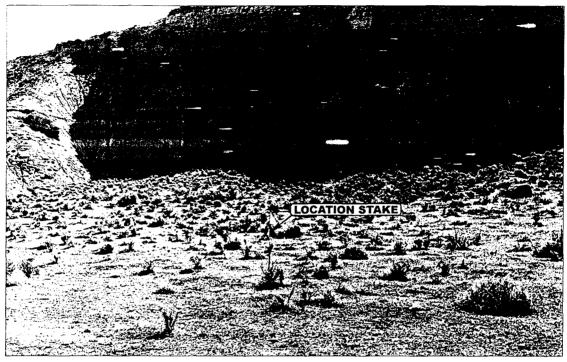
PHOTO: VIEW FROM CORNER #1 TO LOCATION STAKE
